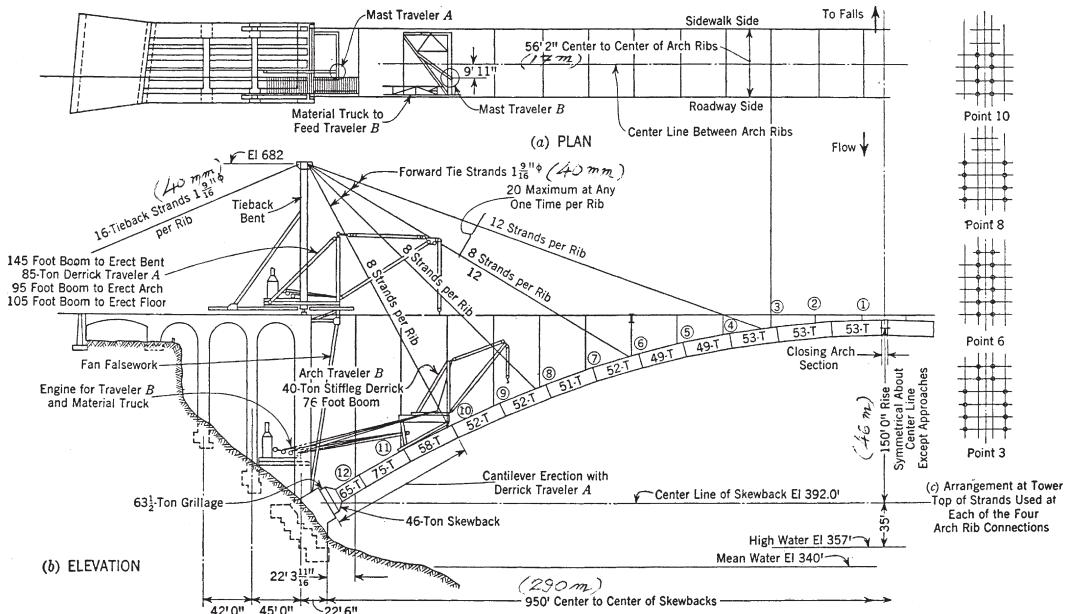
Rainbow Bridge, Niagara Falls, New York, showing successive arch tieback positions (Durkee, 1945). Arch-rib erection geometry and stressing were controlled by measured tieback tensions in combination with surveyed arch-rib elevations.
